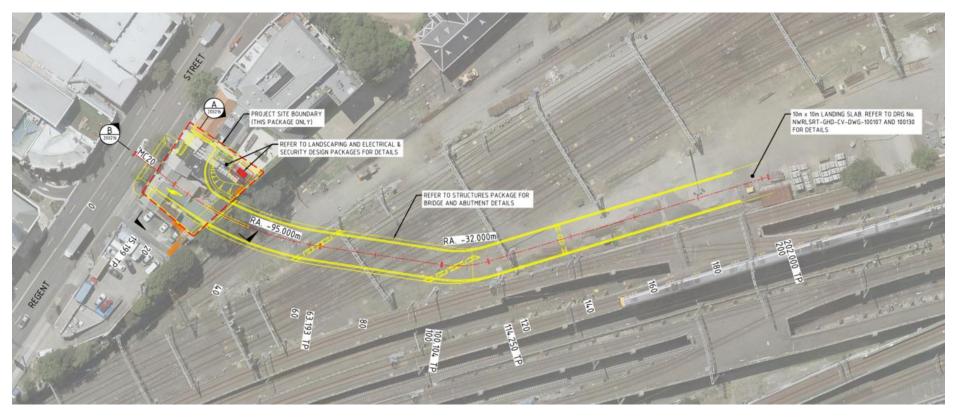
Piling locations in relation to SYAB project (provided by LoR)
